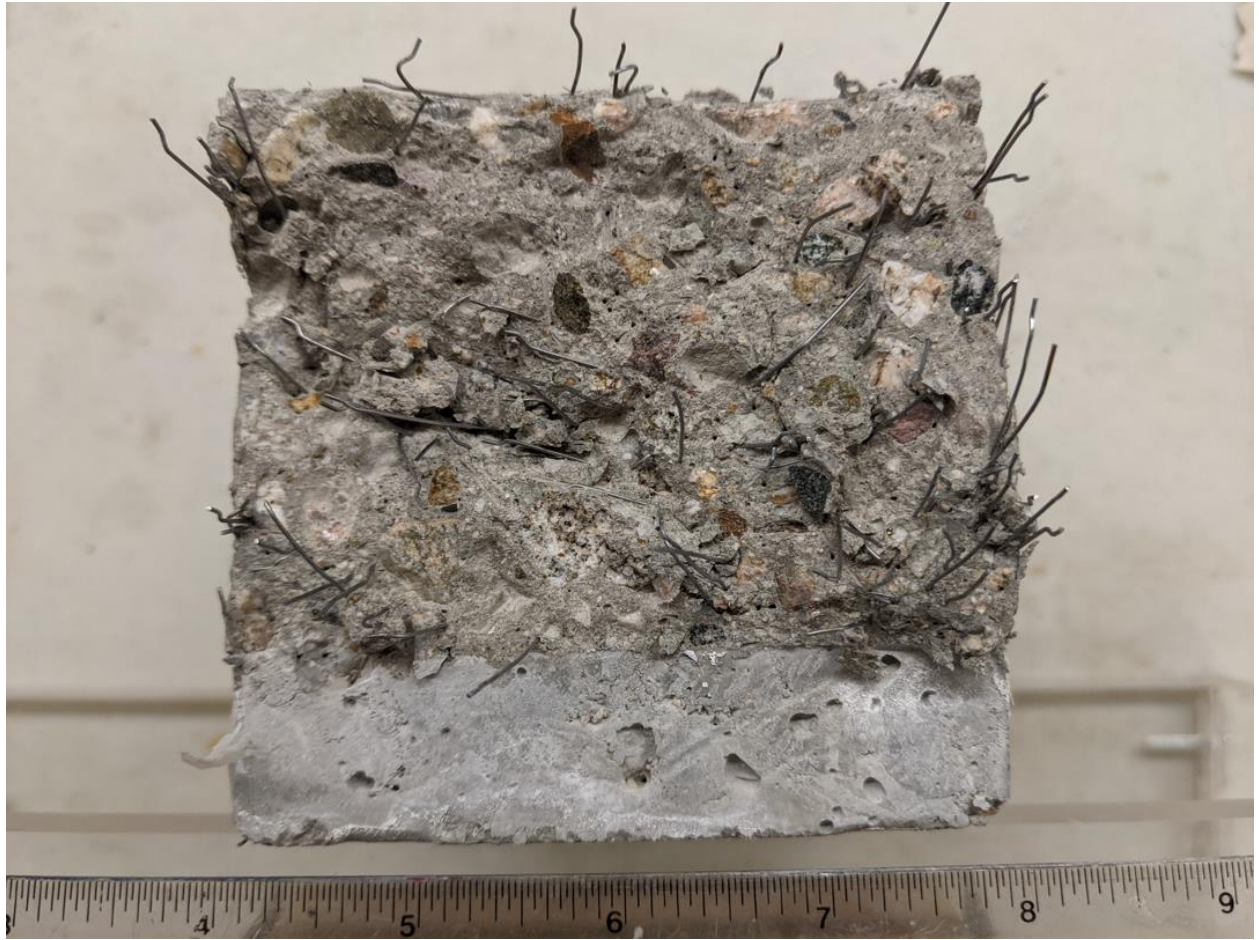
The section of failure of the fiber-reinforced concrete without PCM (HFRC) tested by three-point bending.
